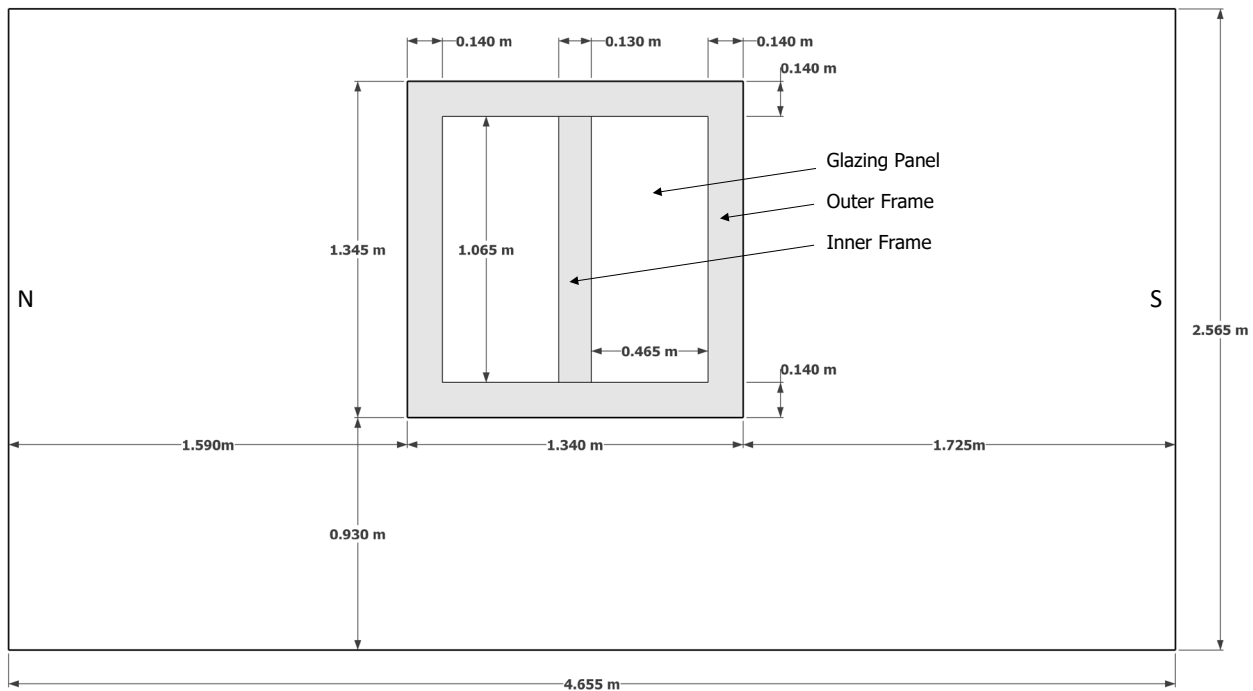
Cell B dimensioned west wall with window elevation, exterior view
